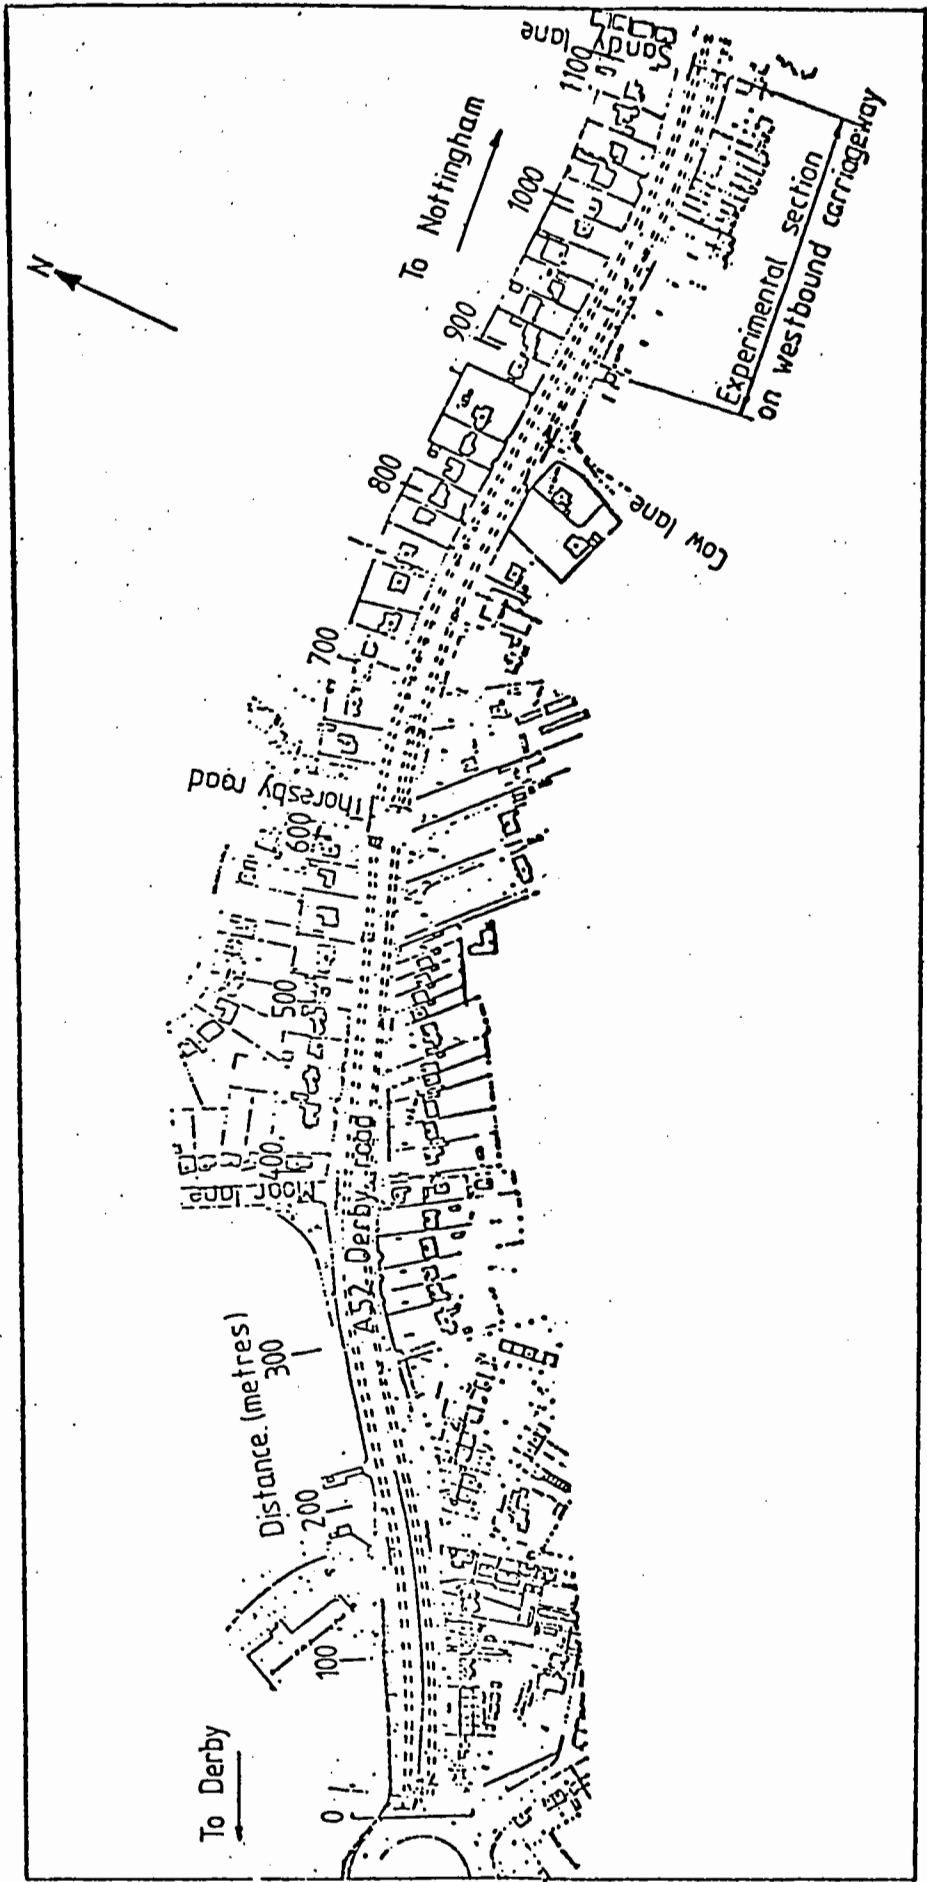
SITE PLAN OF RECONSTRUCTION A52 DERBY ROAD, NOTTINGHAM
